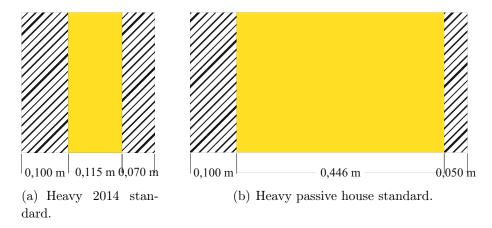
Heavy external wall constructions, where left side faces internal and right side faces external conditions.
